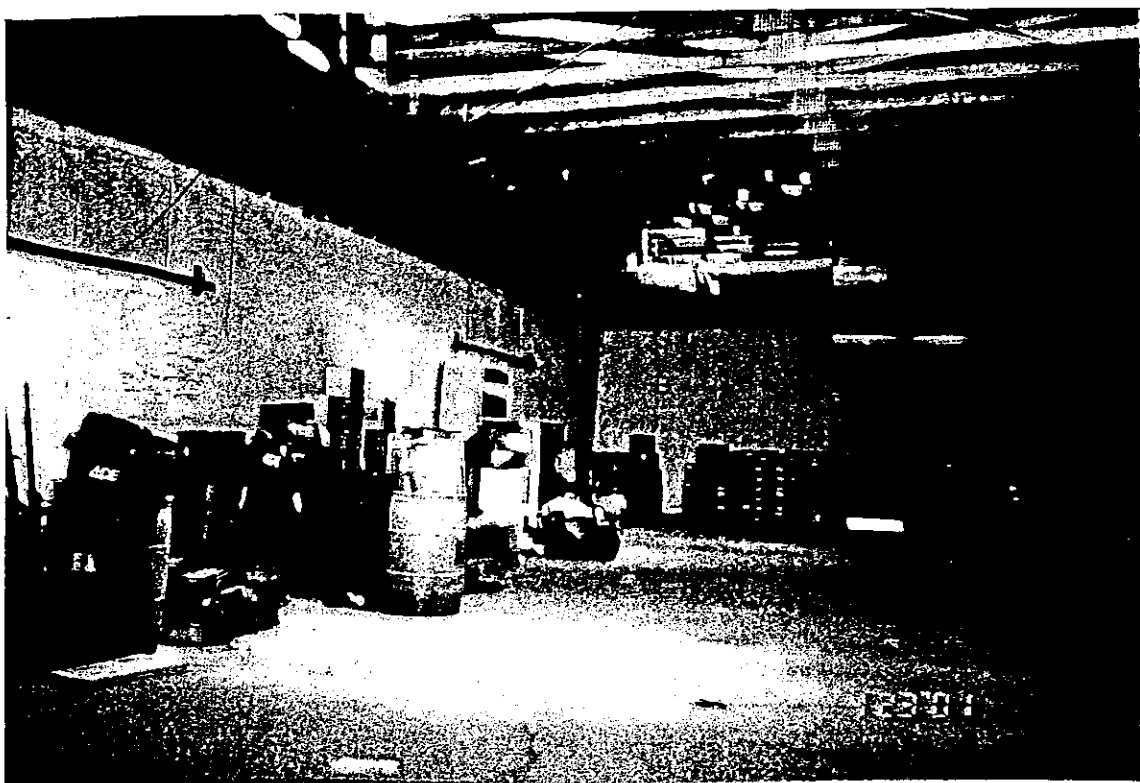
General view of warehousing (non-hazardous). Concrete floor slab is in good repair.
